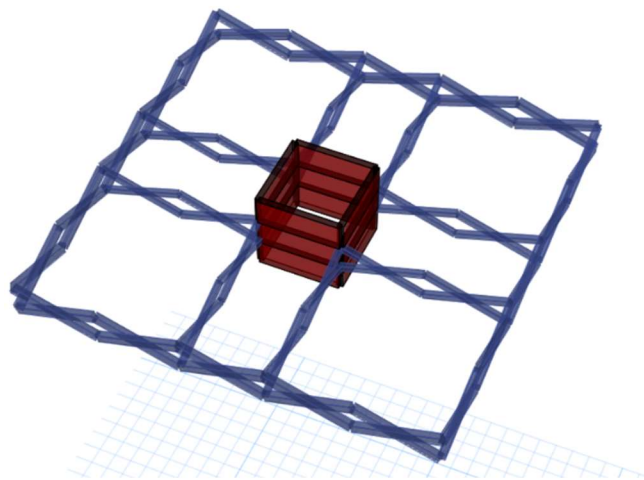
Plan view of frame with centre core outrigger and belt truss.
